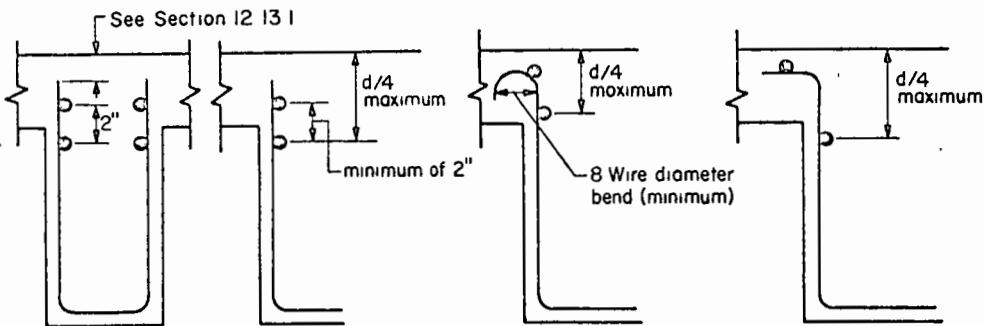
Anchorage of welded plain wire fabric U-stirrups
